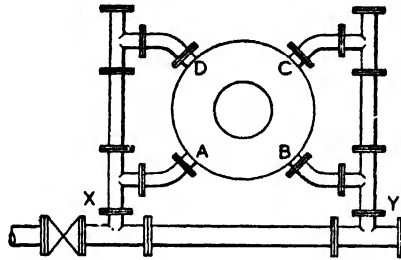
SIMPLE ARRANGEMENT OF PIPING WILL STARVE BRANCH A AND GIVE BRANCH C EXCESS
